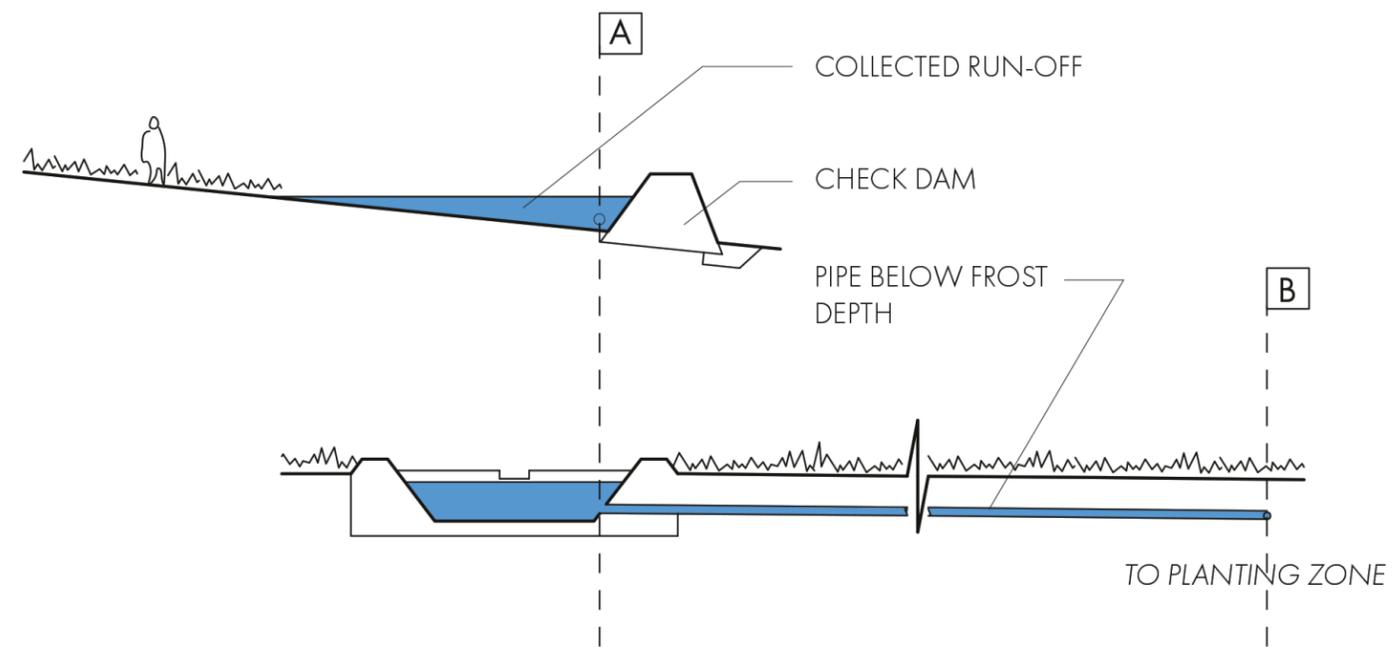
1:100 WATERCOURSE SECTION DETAIL 01
